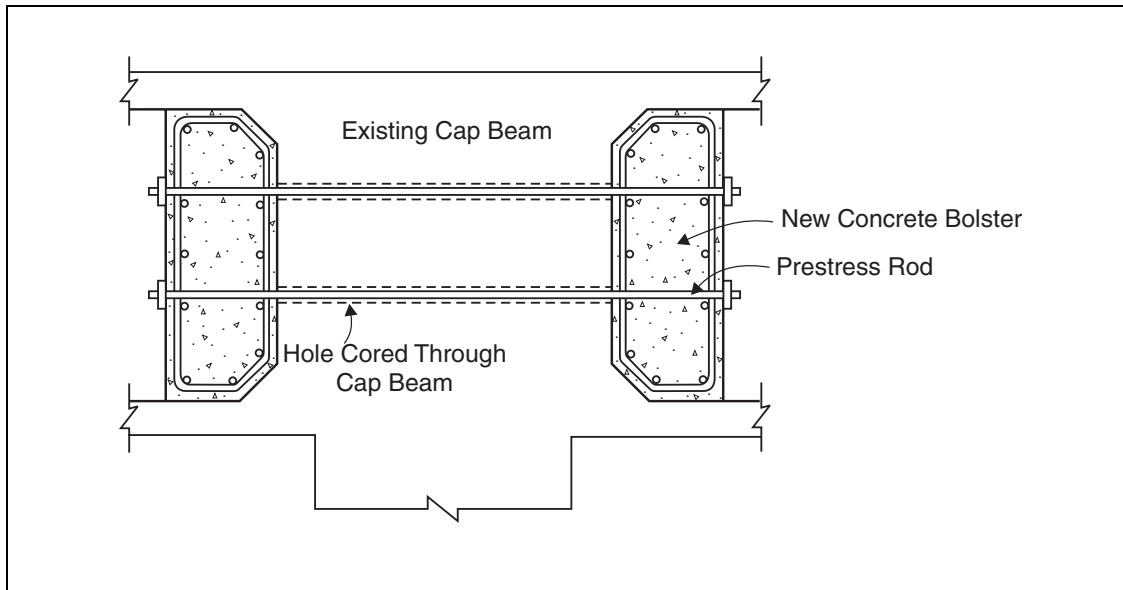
Retrofit of an integral cap beam joint for longitudinal loading.
